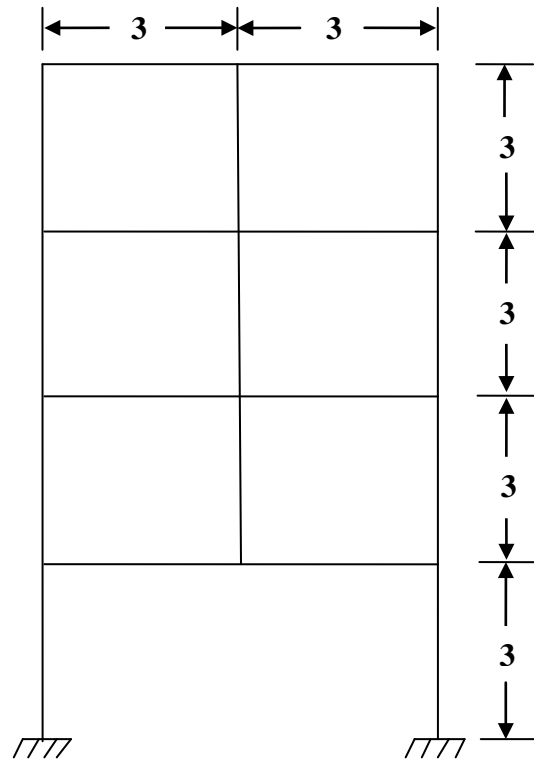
Geometry of the 2 dimensional frame with floating column. Dimensions are in meter
